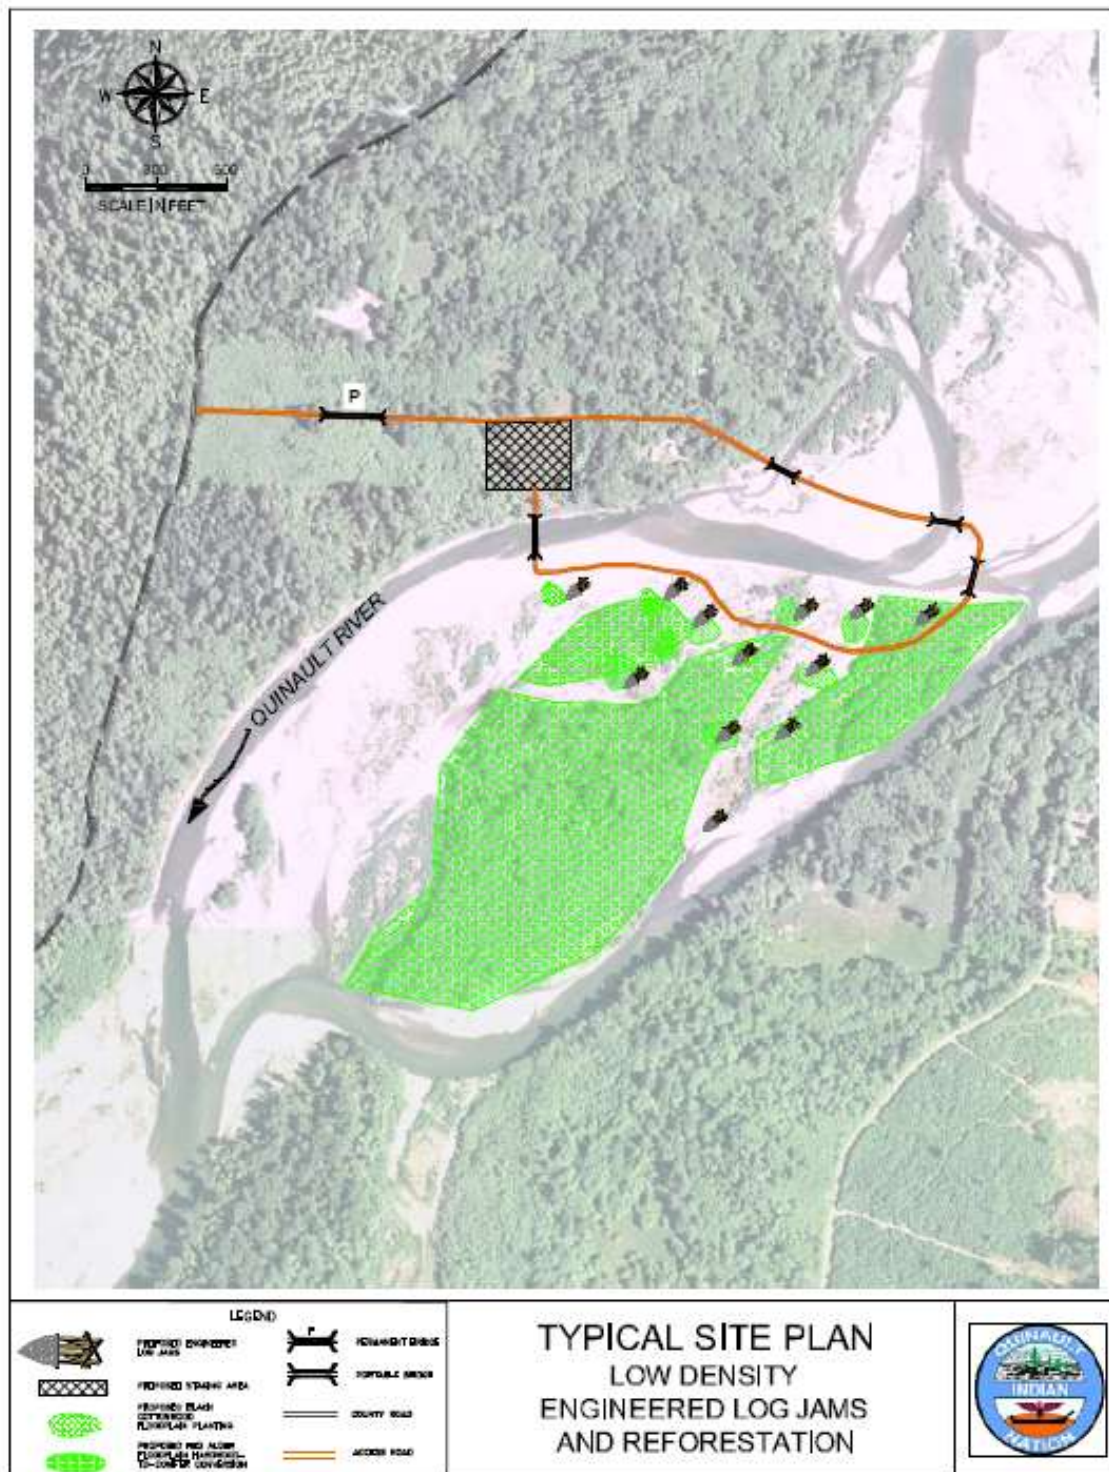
ELJ &amp; Reforestation Site Plan Sheet 1.
